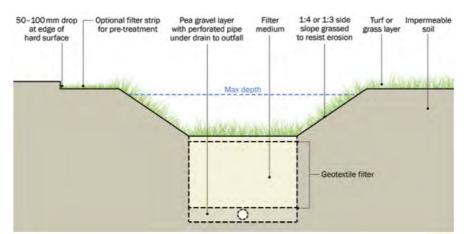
CIRIA C753 Figure 17.2 – Typical dry swale
